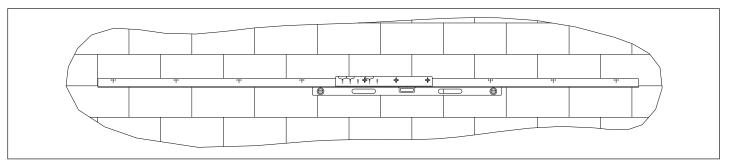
Install Additional Horizontal Wall Angles Horizontally
